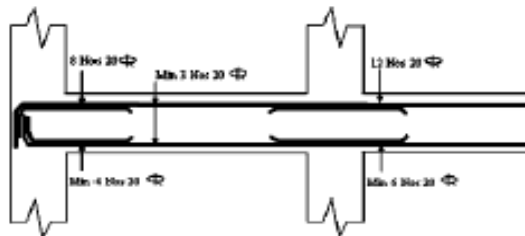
Longitudinal reinforcement at the joints in a beam
